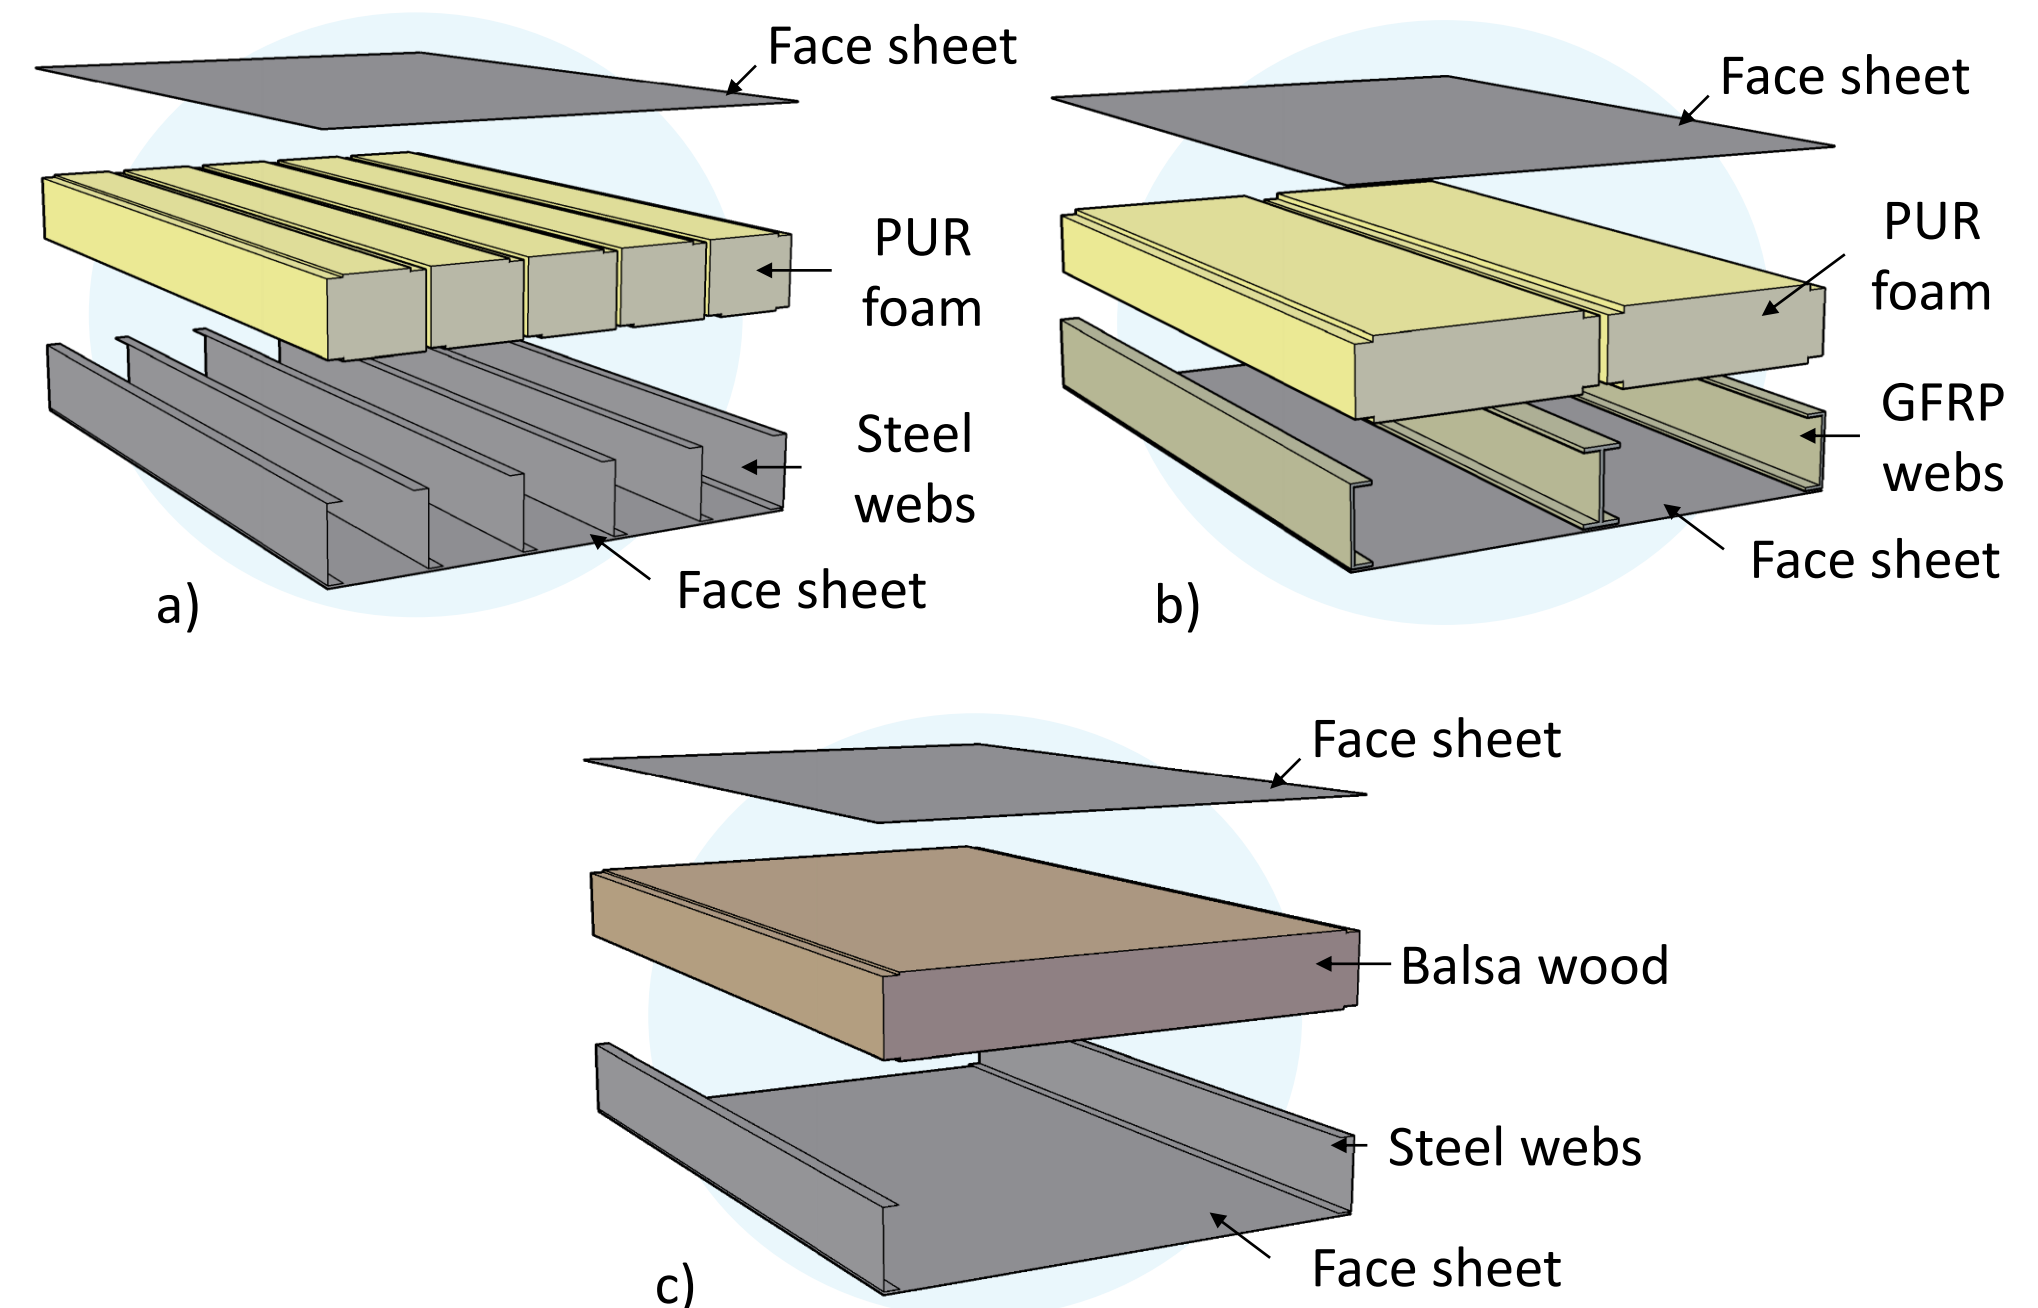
Layout of a) steel + PUR core system, b) GFRP + PUR and c) steel + balsa wood
